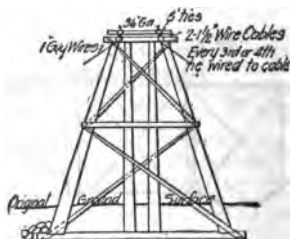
Details of Timber Bent for Wire Rope Trestle.
